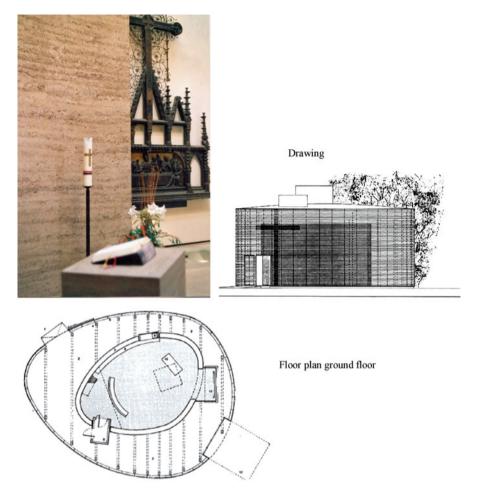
Chapel of Reconciliation Berlin, load-bearing rammed earth wall construction [107]
